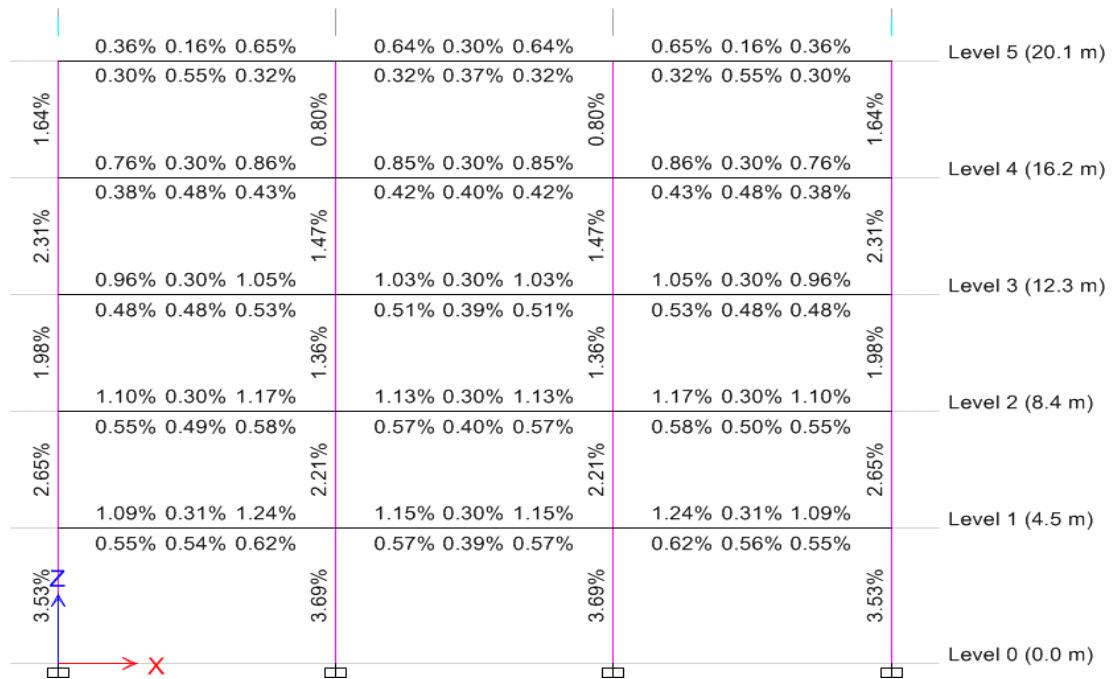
Required longitudinal reinforcement for building ID 2433
